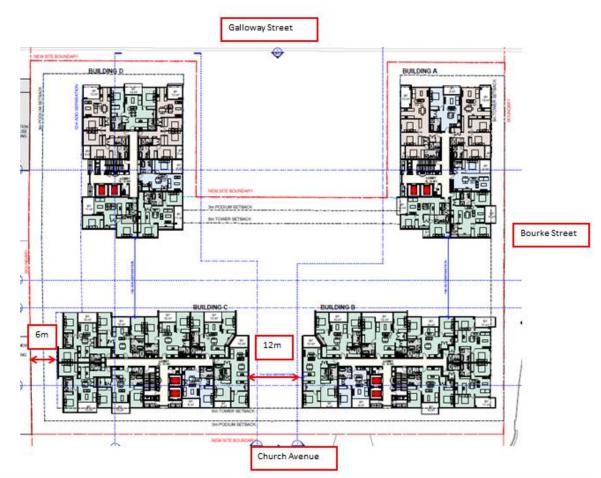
Typical floor layout showing the building separation non-compliance and location of surrounding streets
